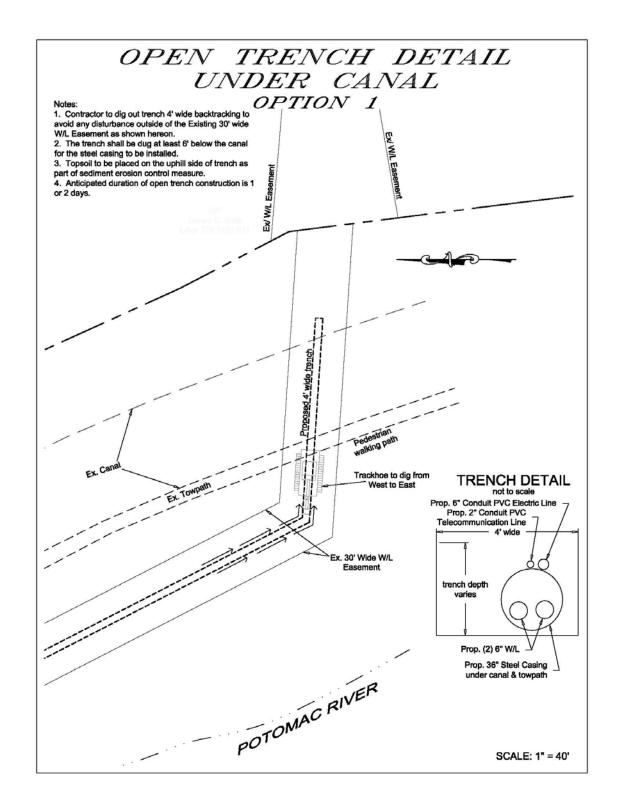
Alternative C, Construction Option 1 – Open Trench under Canal.
